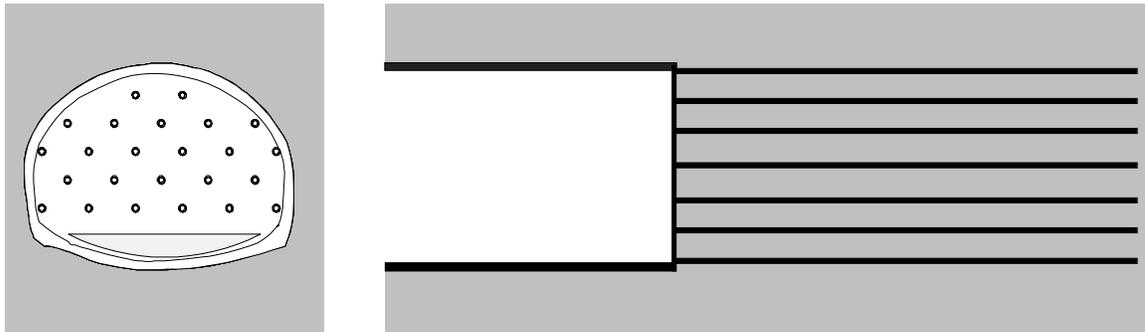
Soil nailing at the face of the excavation in soft ground tunnelling
